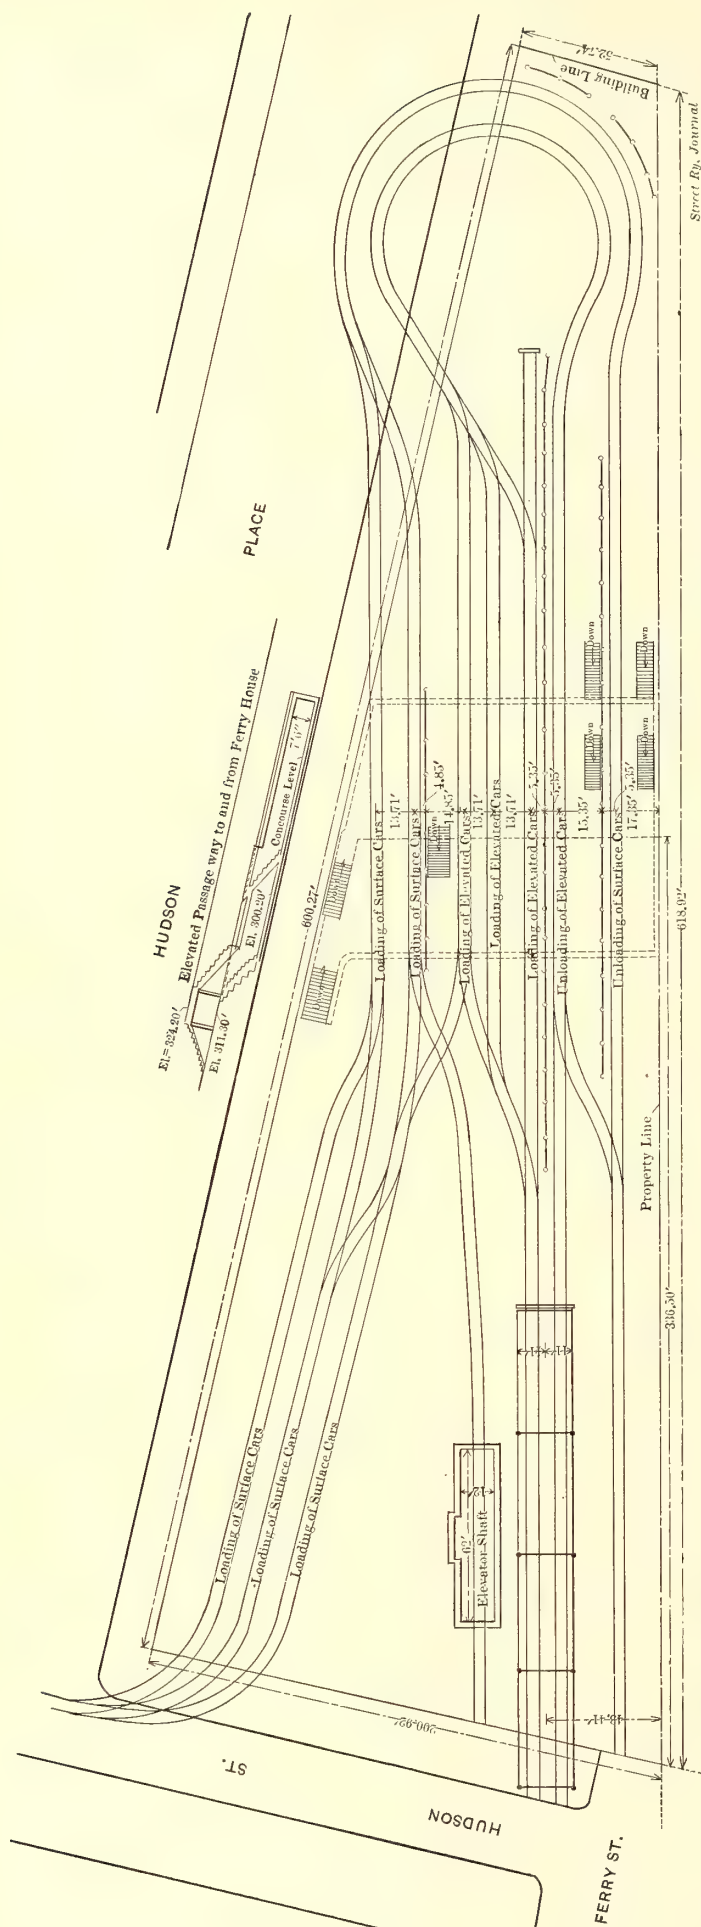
PLAN OF SURFACE TRACKS AND STAIRWAYS TO CONCOURSE AT THE HOBOKEN TERMINAL
